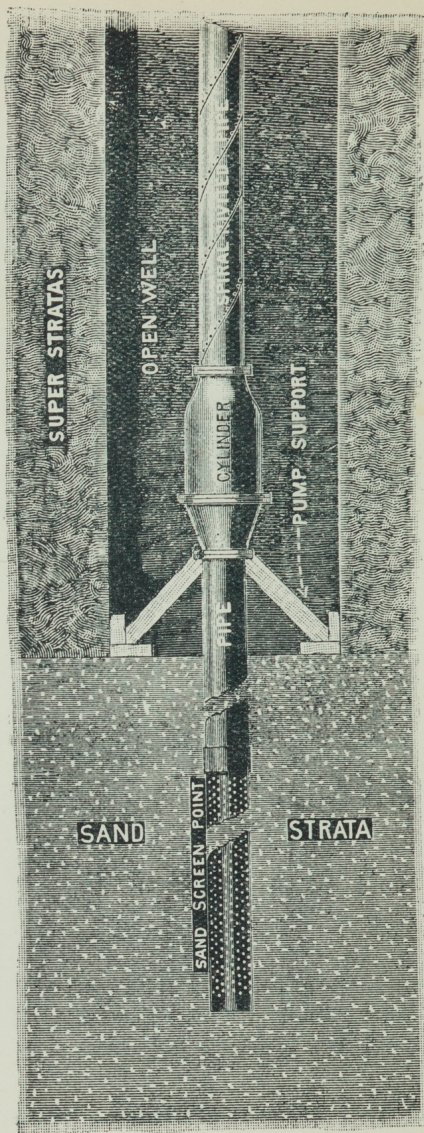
Side view of Pump Cylinder, used with Screen Point, and the correct method of bracing same to prevent its settling and then getting out of proper relation with the working parts of Pump.
